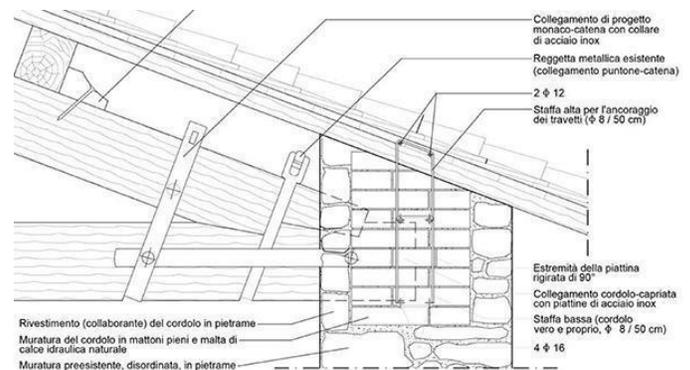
Reinforced masonry curb and connection with the roof. ©Arch. E. Matteuzzi
